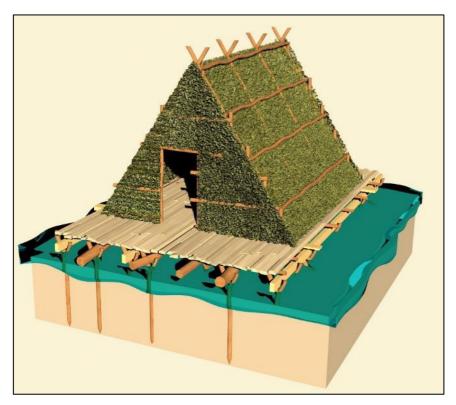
The A-Frame house of La Draga reconstructed using Rhinoceros 5 (model by the author).
